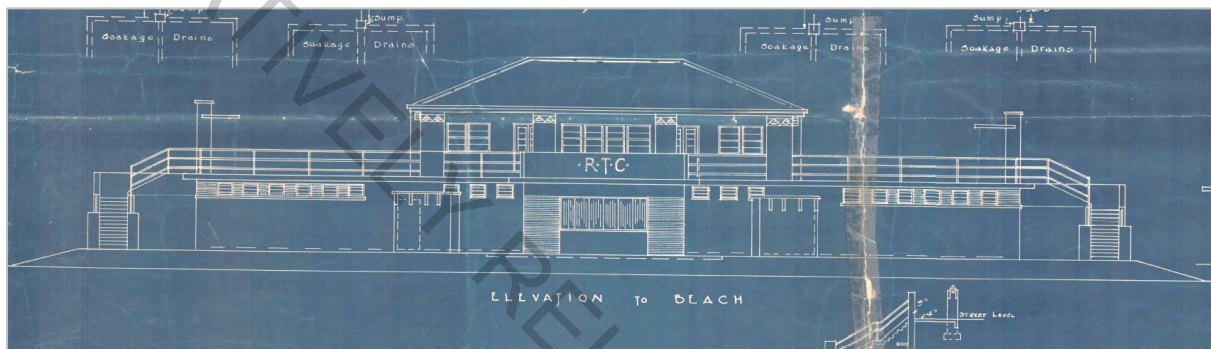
Elevation to the beach, 1937 plan (MBRC Library).
